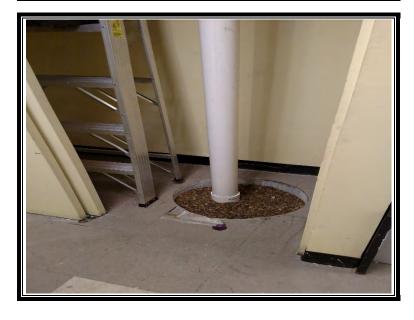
Suction Pit at Bank, showing thickness of concrete
